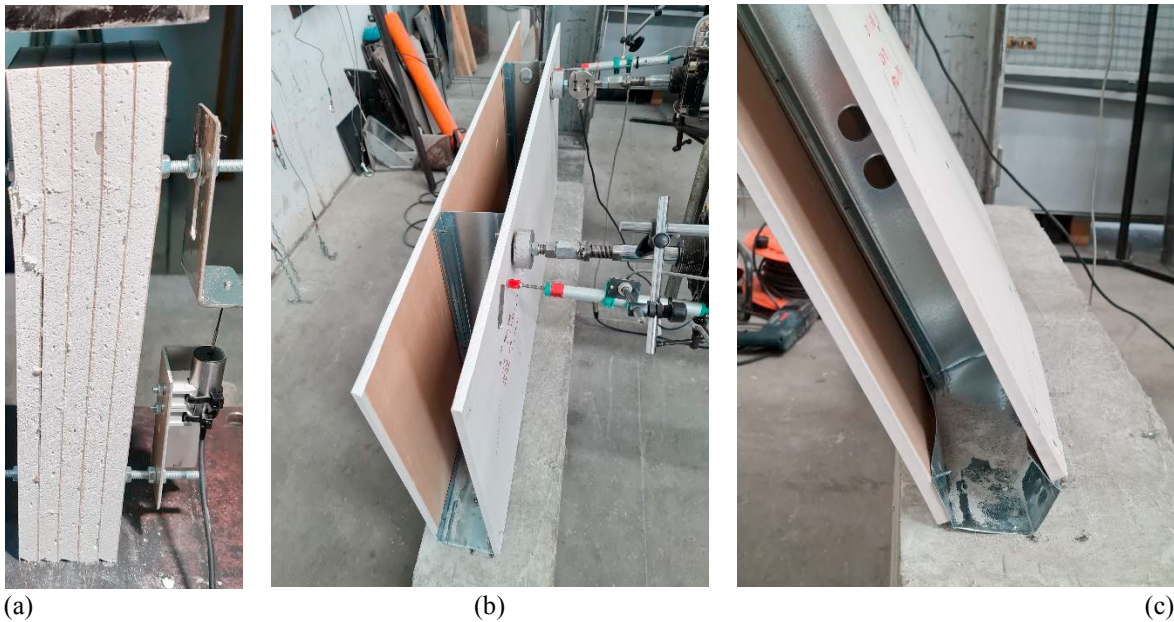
(a) Compression test on gypsum specimen comprised of five 12.5-mm thick layers; out-of-plane bending test on the bottom connection of a gypsum-sheathed partition: (b) specimen at the beginning of test and (c) failure of the track profile.
